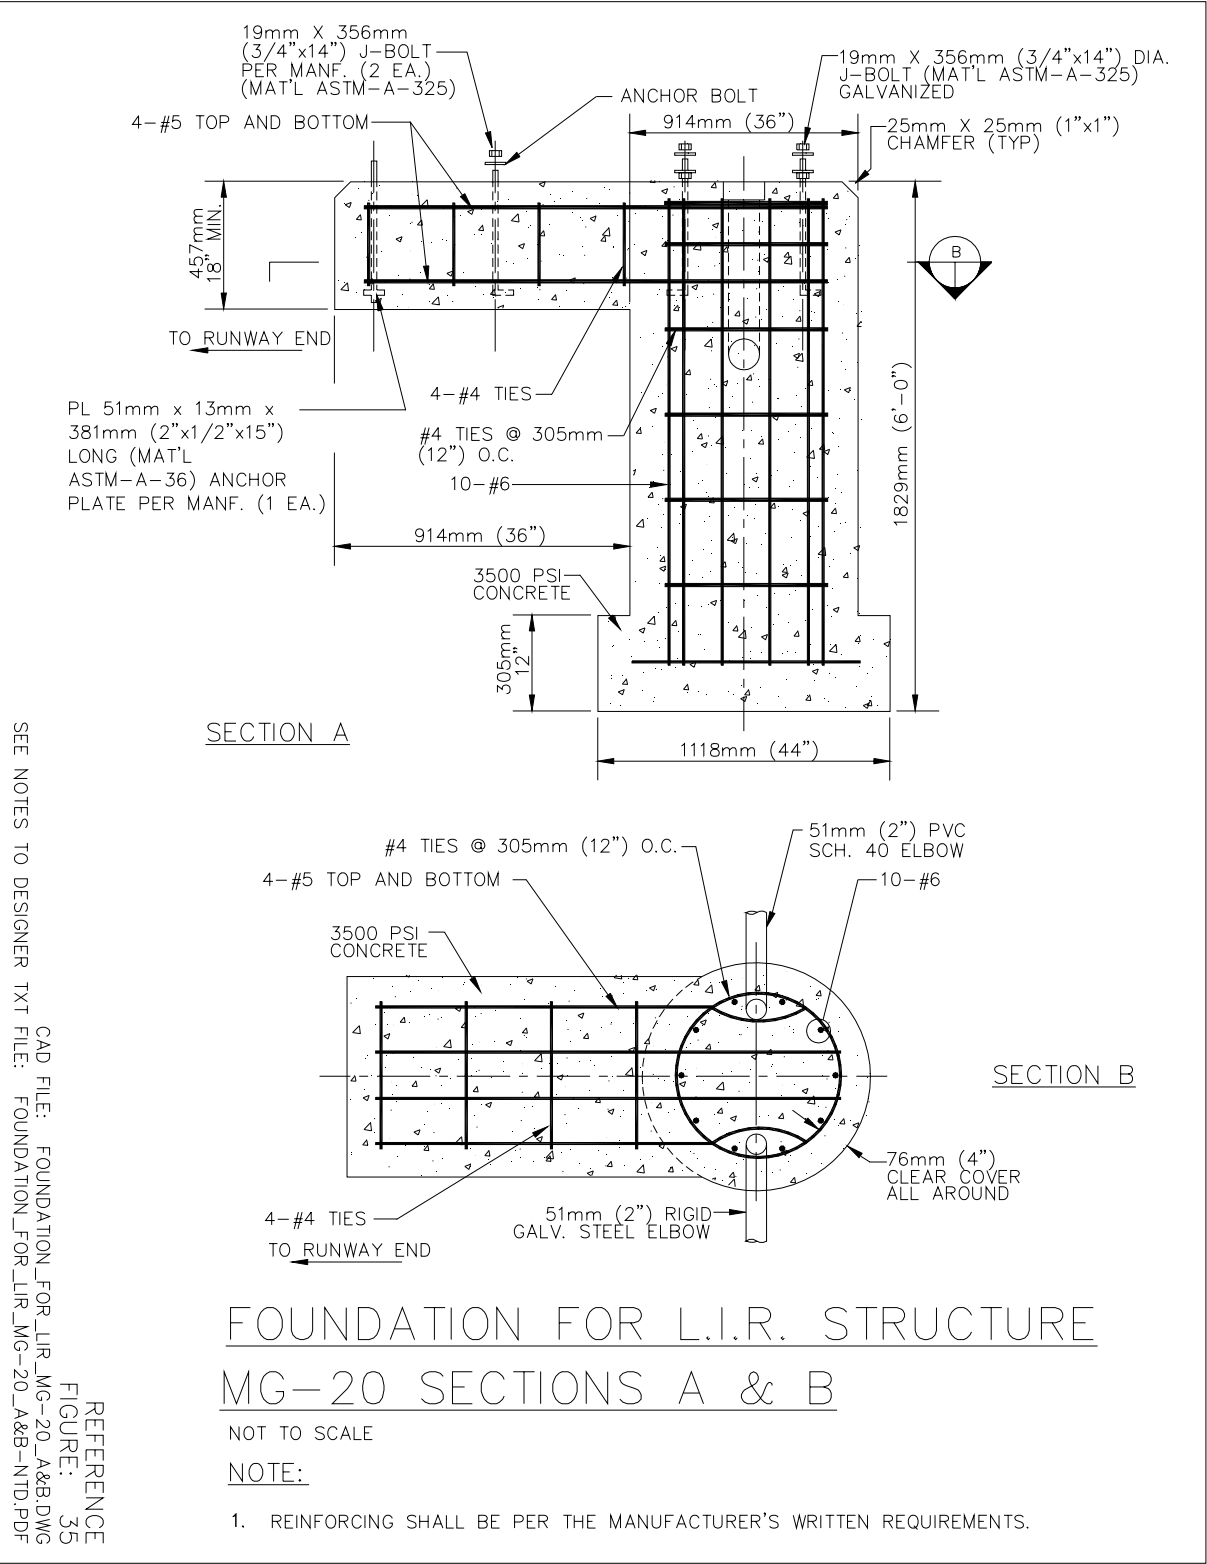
Foundation for L.I.R. Structure MG-20 Sections A & B
